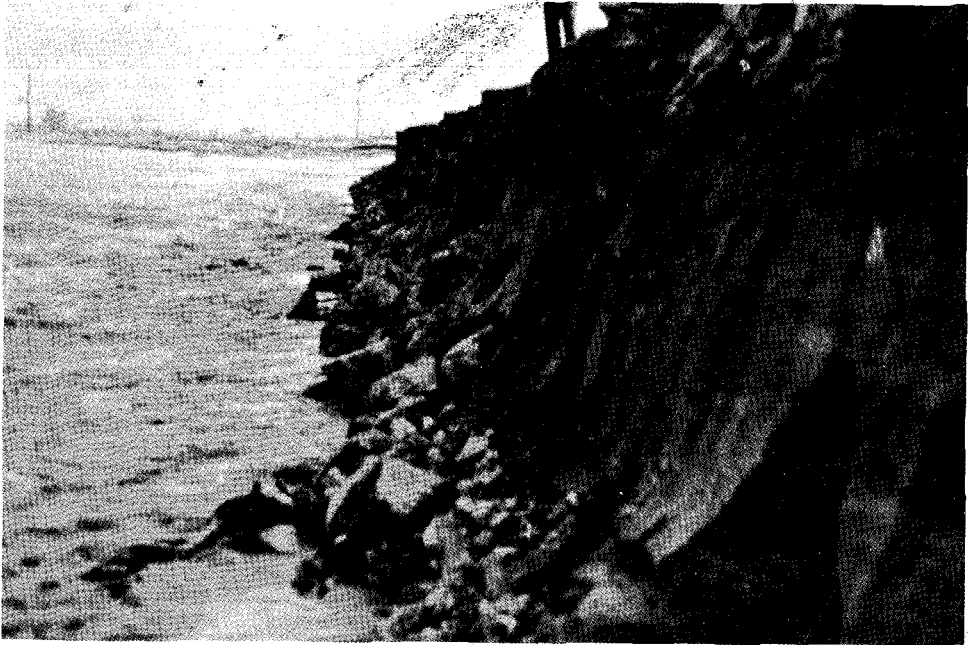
Eroded levee toe on the San Jacinto River (looking upstream).
